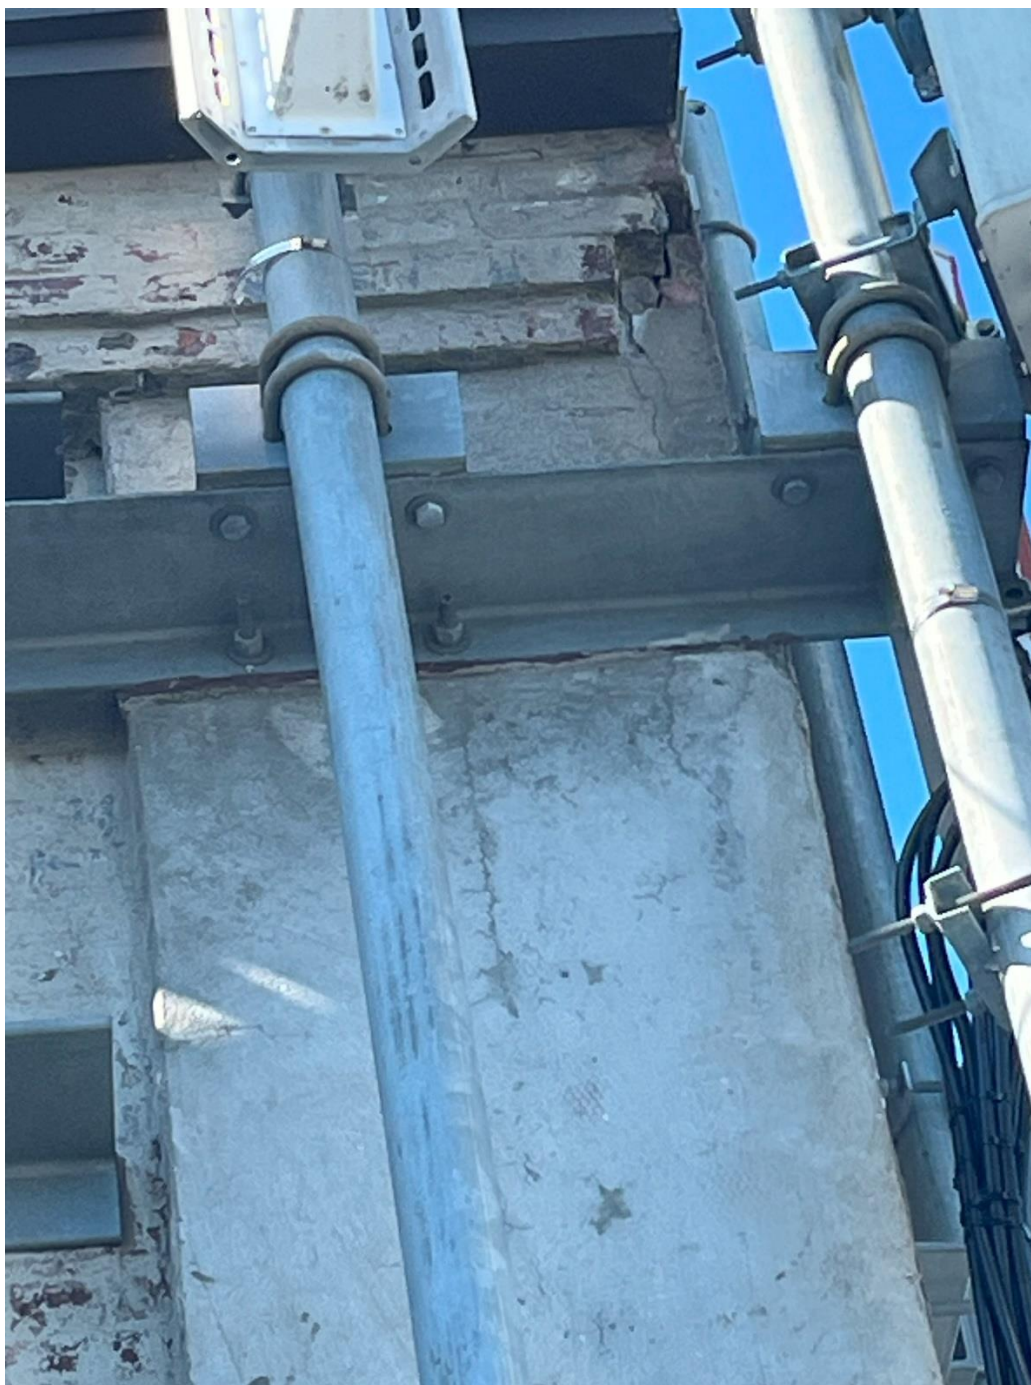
Additional vertical cracks observed at SE exterior cable tray wall corner below gutter abutting Alpha sector parapet elevated at approximately 25'
